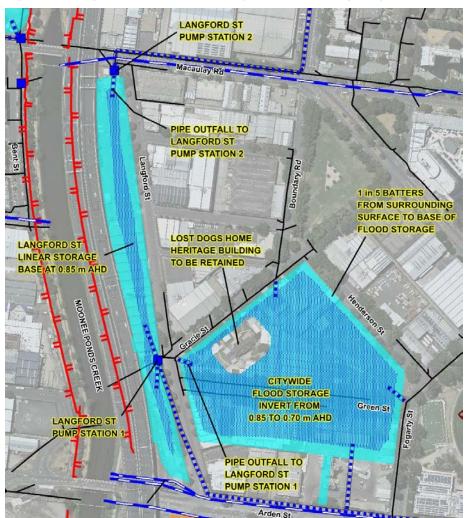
Langford Street Linear and Citywide Flood Storages layout
